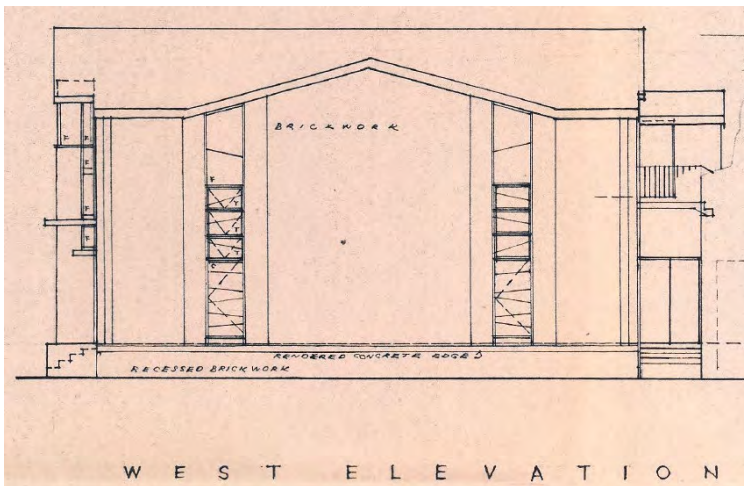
Drawing dated July 1961 (Dr. Ernest Fooks), showing west elevation. (Source: Council Building File)
